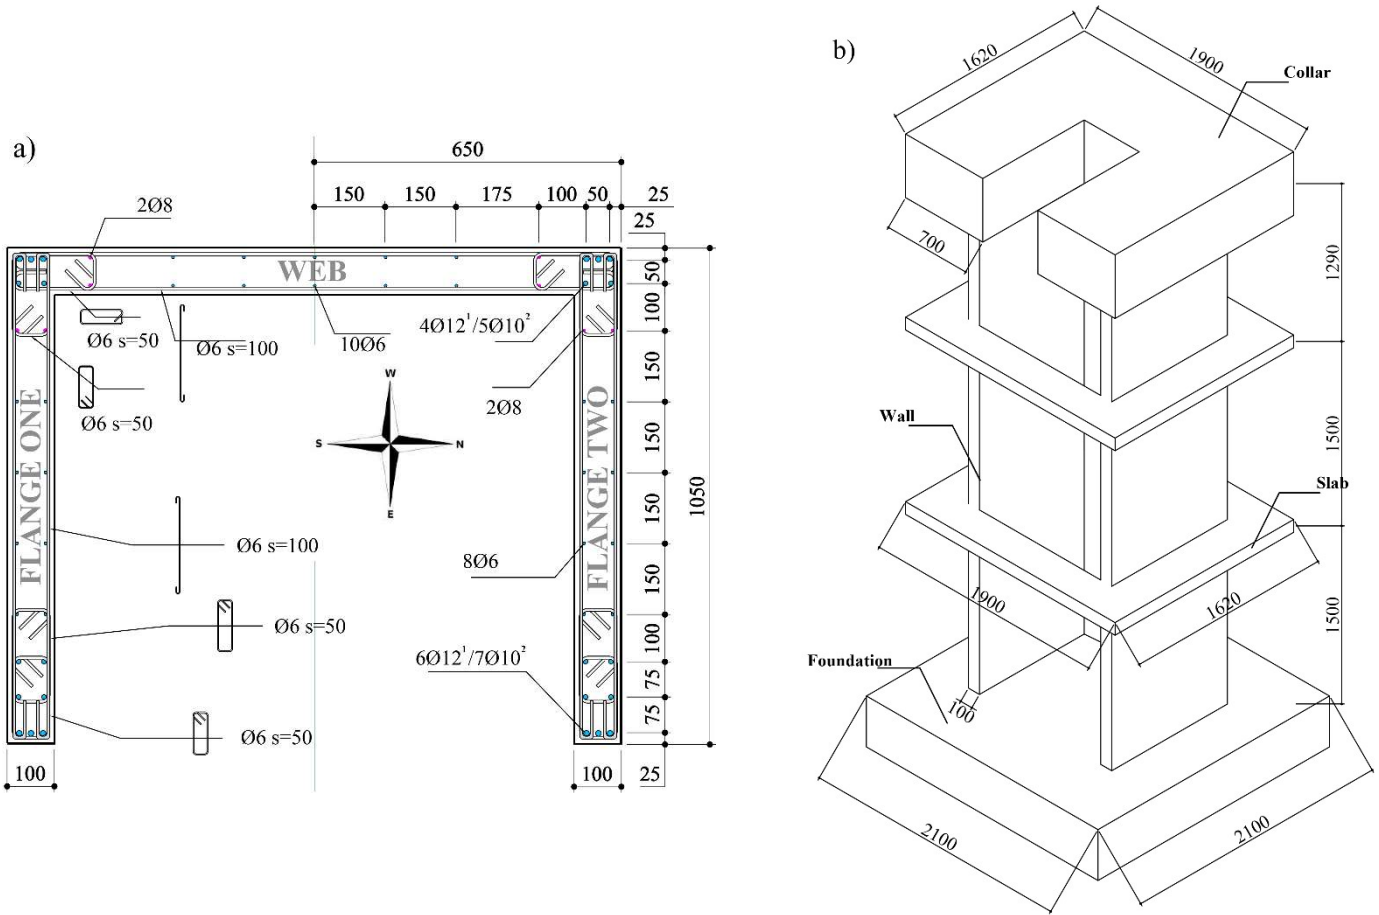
Test unit UWS1 (a) cross-section and reinforcement layout and (b) elevation view. All dimensions are in millimetres.
